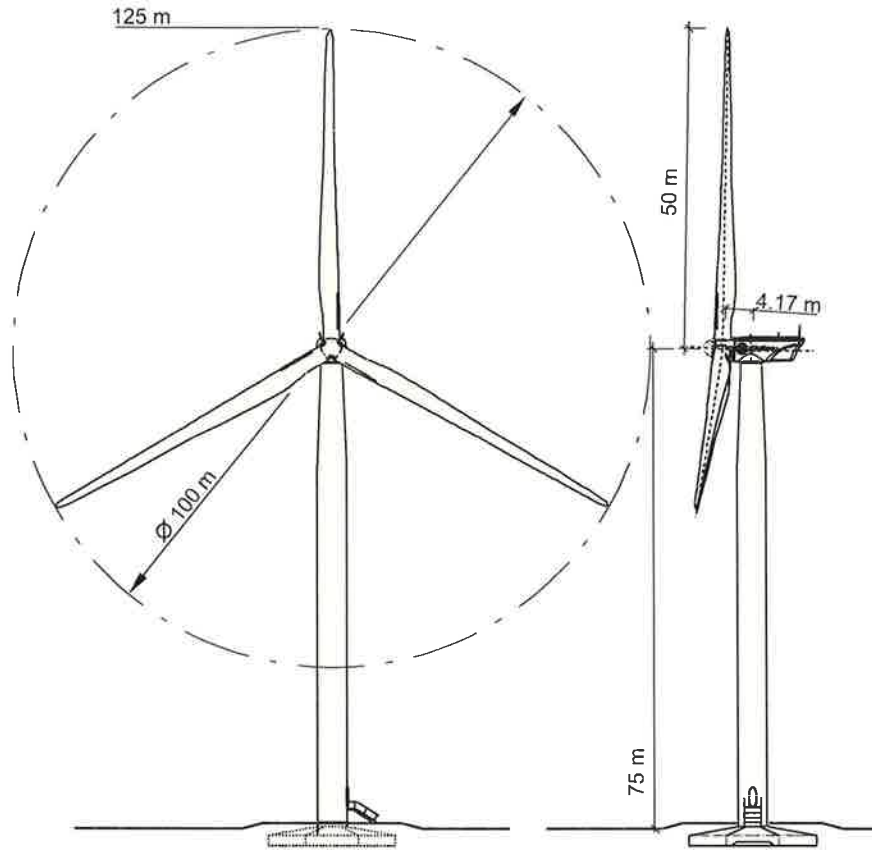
2.5-100 with 75 m hub height and 100 m rotor diameter
